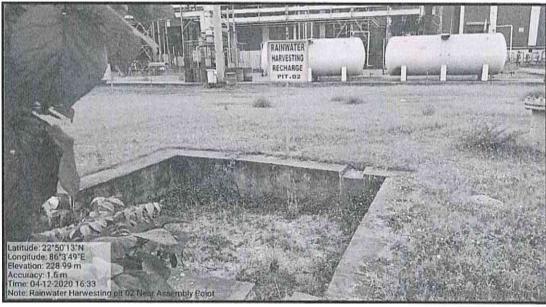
PHOTOGRAPHS OF CONSTRUCTED RECHARGE STRUCTURE IN PLANT PREMISES
